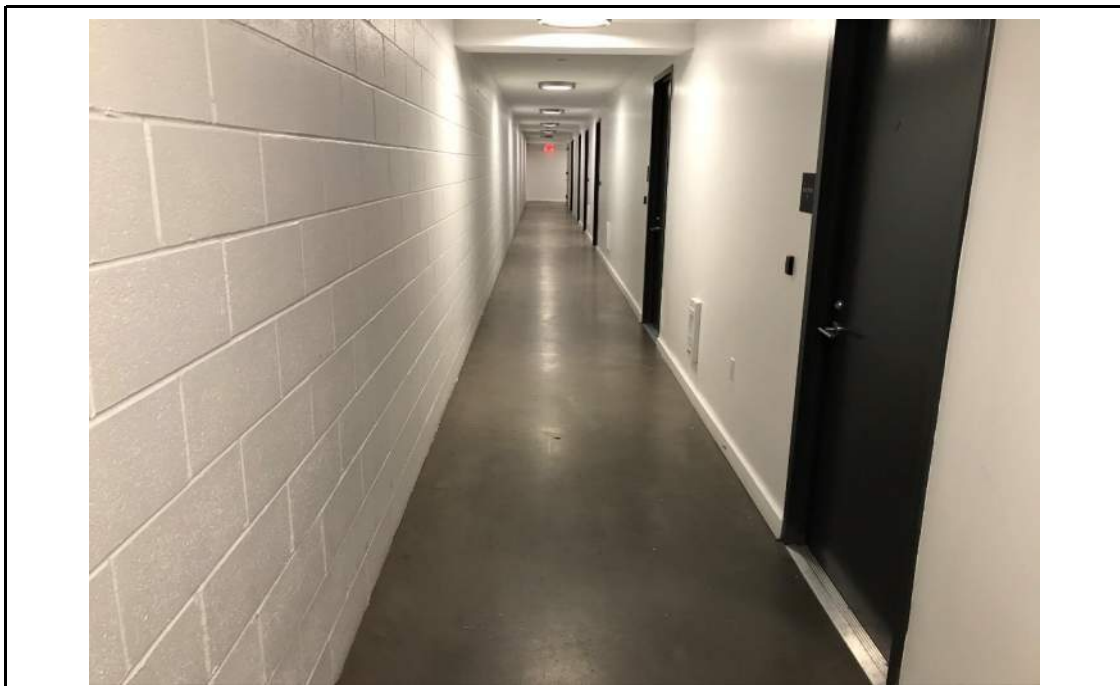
First floor concrete slab within the first floor corridor in the northwest portion of the site, facing west. 6 February 2020.
